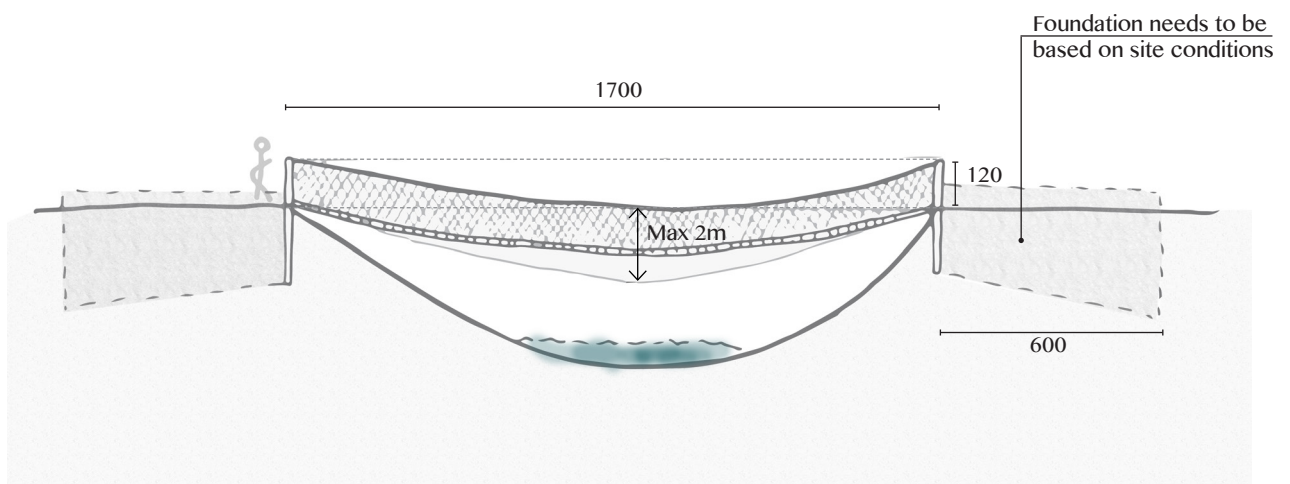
Section F-F' Suspension bridge, scale 1:200, dimensions in cm (based on: Sata, 1977)
